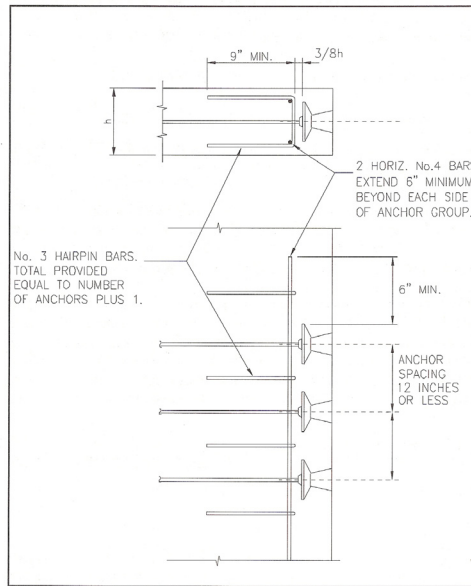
(Typical Mono-Strand Live End Anchorage)
